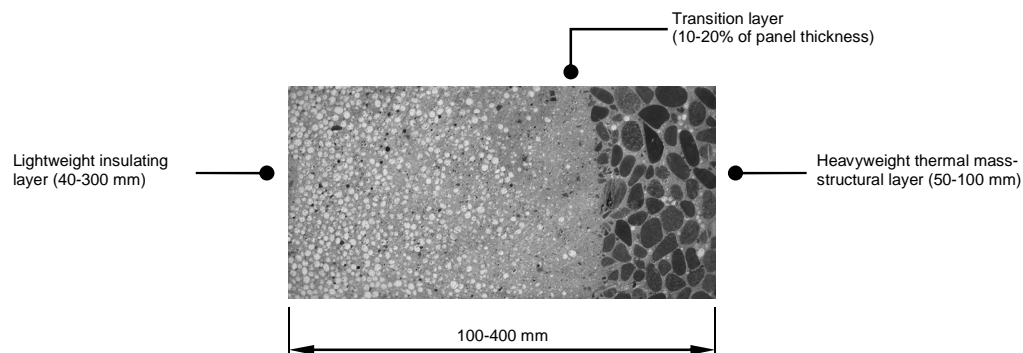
Cross-section of stratified concrete wall panel (rotated 90° anticlockwise from casting position)
